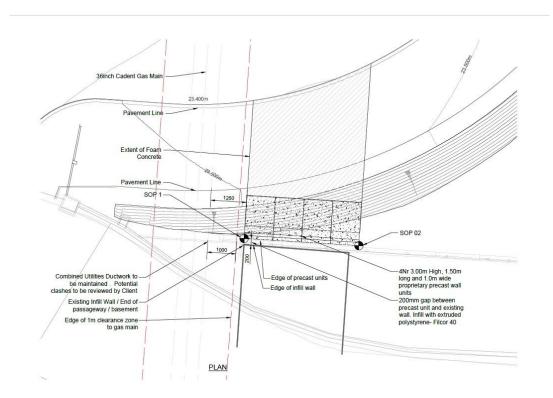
Plan showing the proposed works adjacent to the eastern end of Underpass structure.
